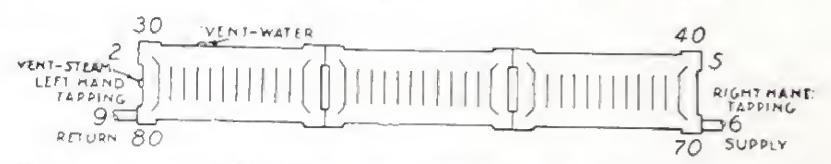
Assembled Three Sections in Single Tier-Water and One- and Two-Pipe Steam
